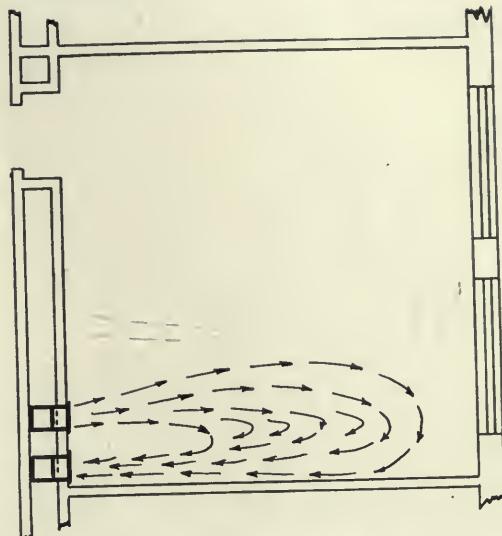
Plan of schoolroom showing effect of locating supply and exhaust openings near one corner of large, square room.
